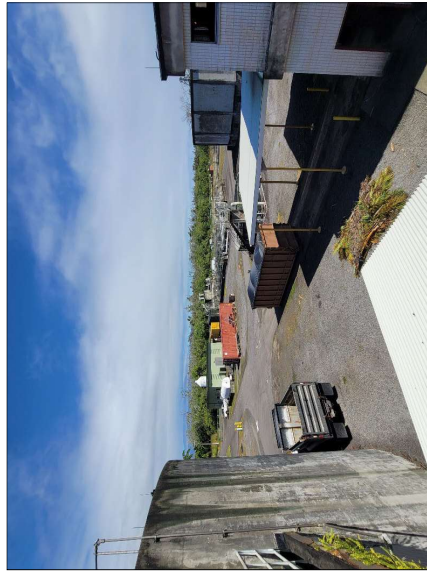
Photo overlooking the Hilo WWTP from the existing digester control building; view to northwest
